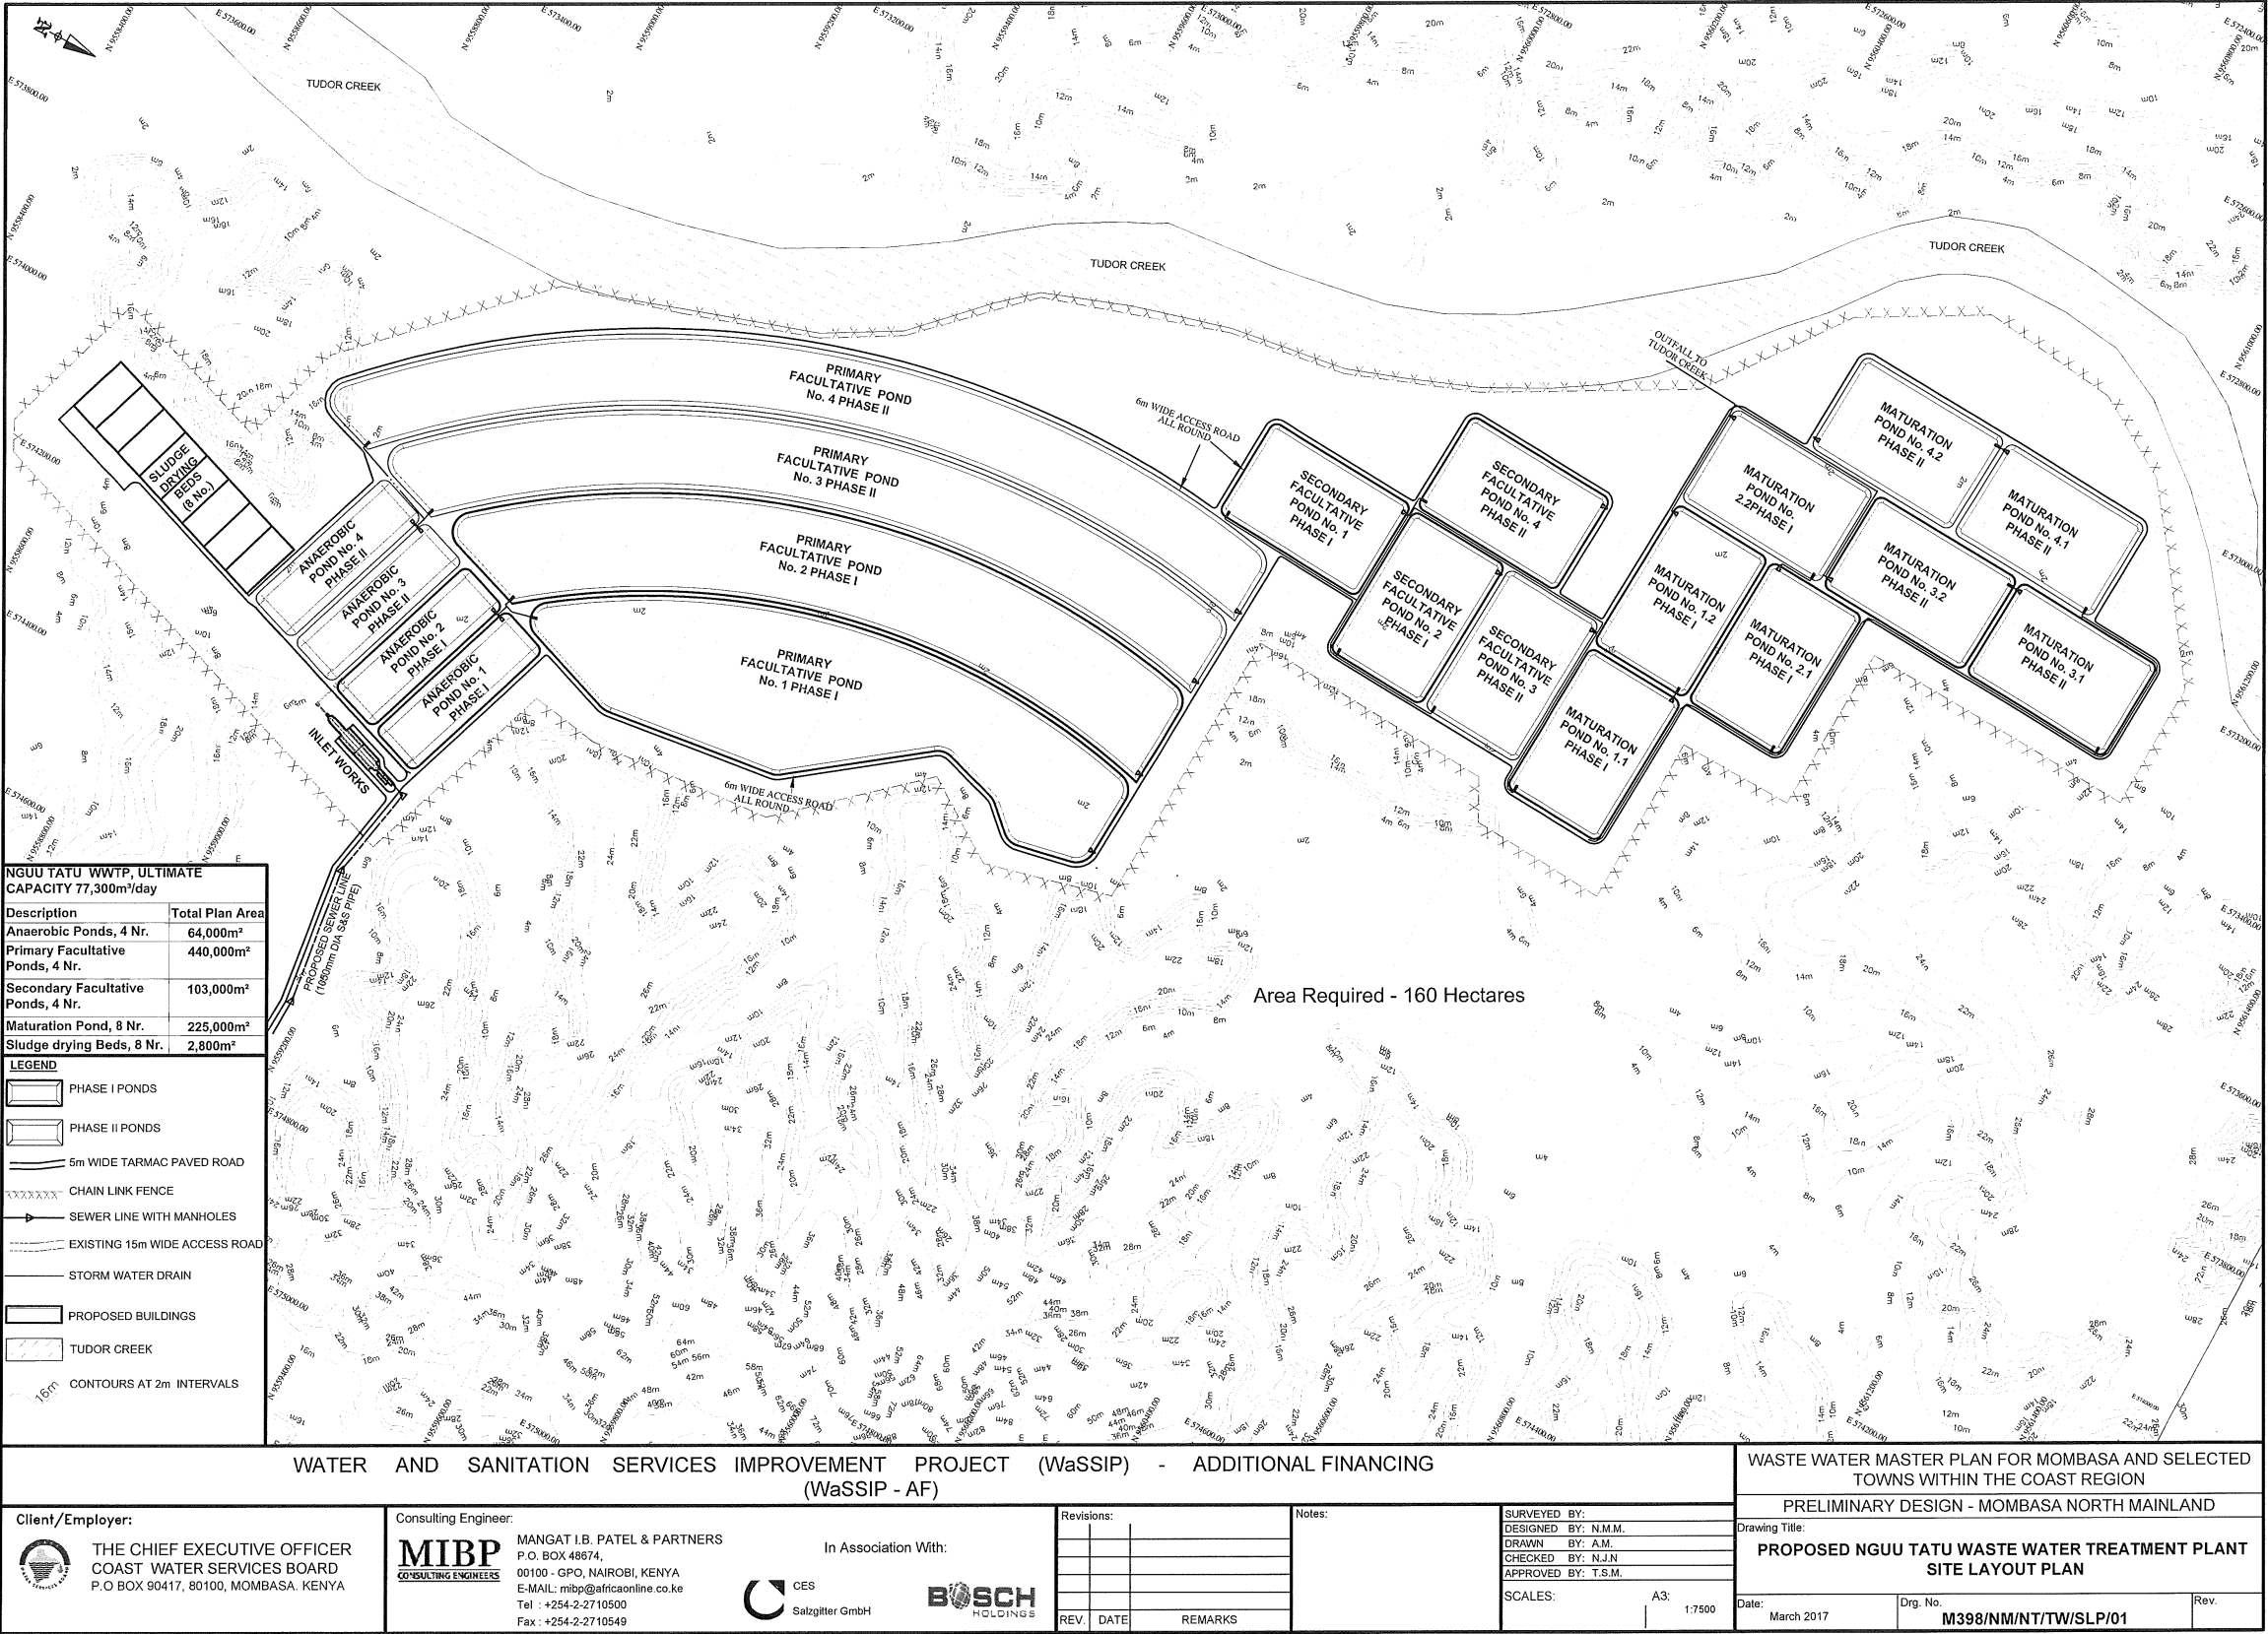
Site Layout Plan for Proposed Waste Water Treatment Plant – Nguu Tatu
